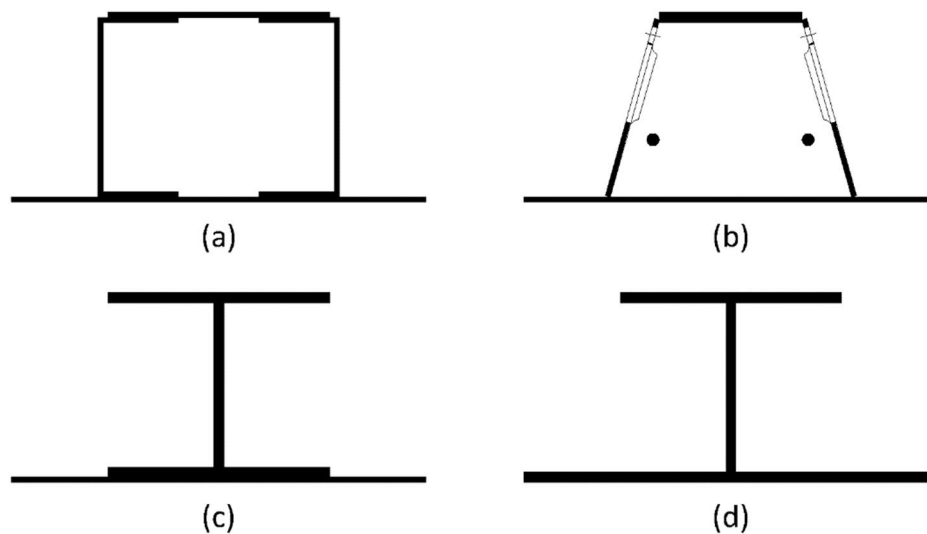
Different types of shallow (slim) floor beams (steel cross-section): (a) Thor-Beam, (b) Deltabeam, (c) Slimflor and (d) Asymmetric Slim Floor beam
